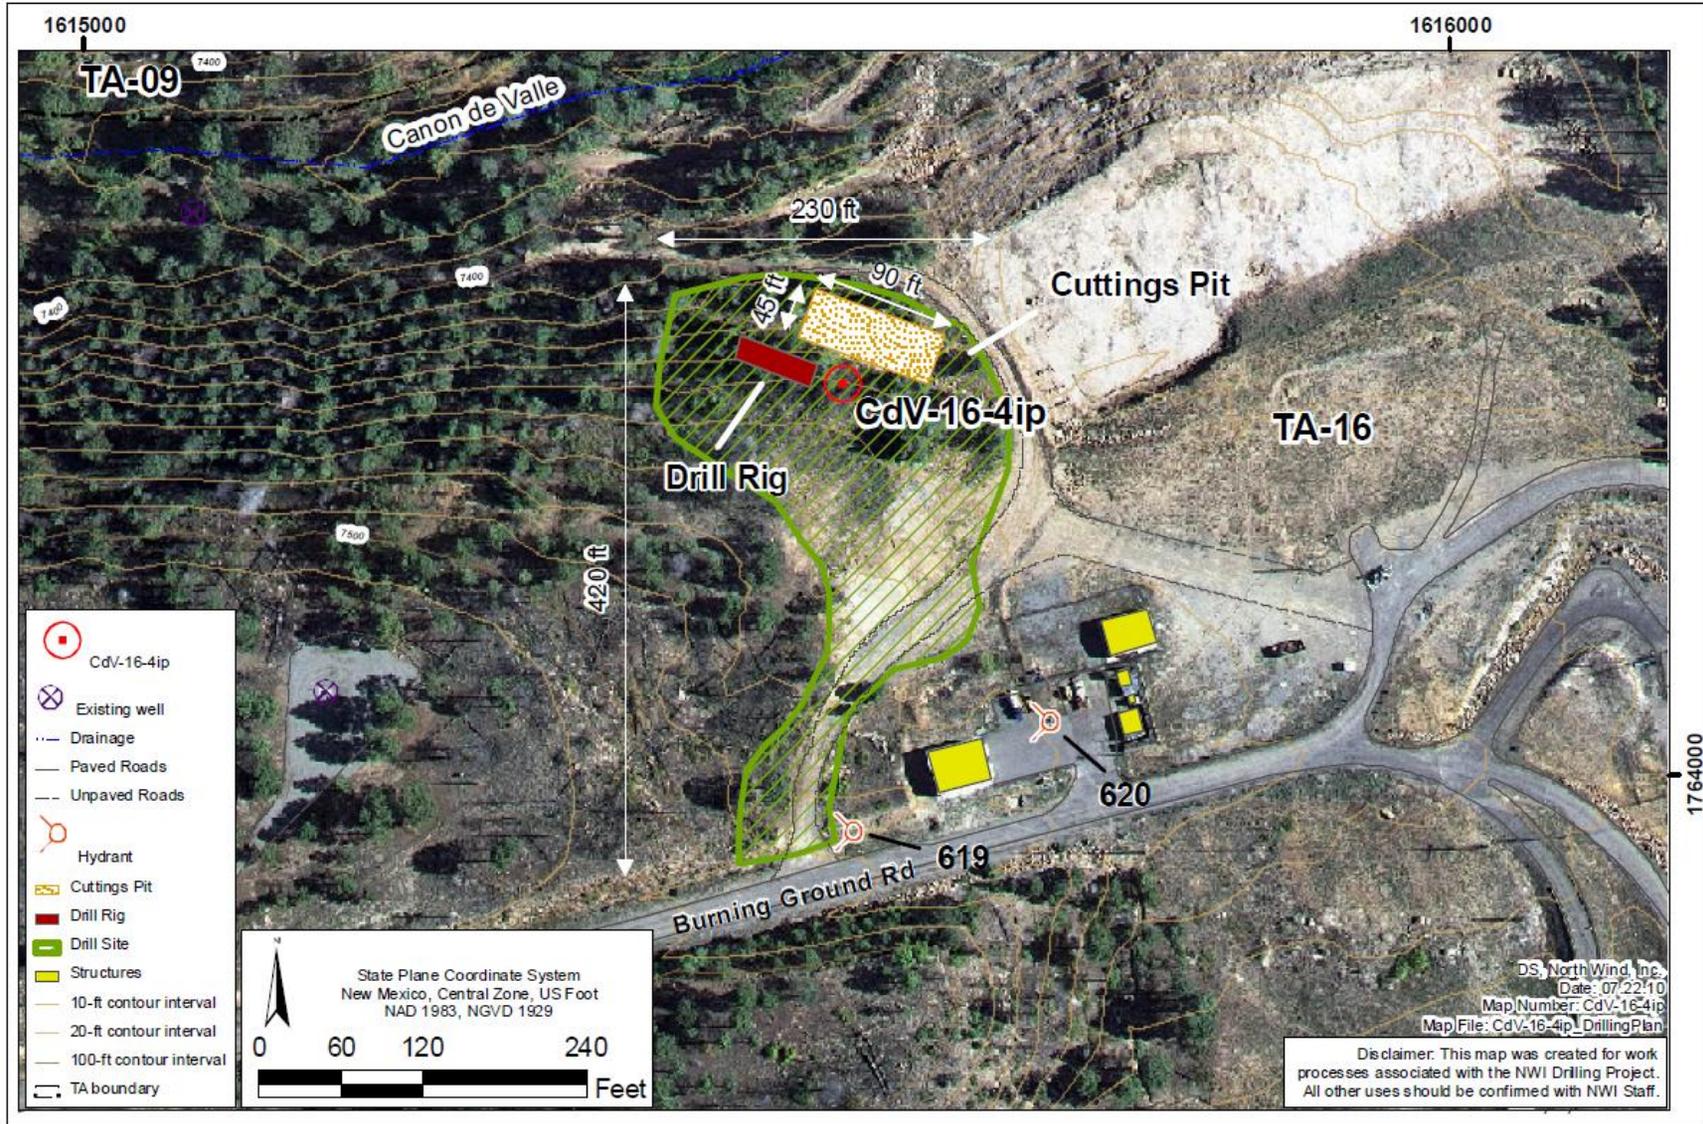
Well CdV-16-4ip site layout and dimensions.
